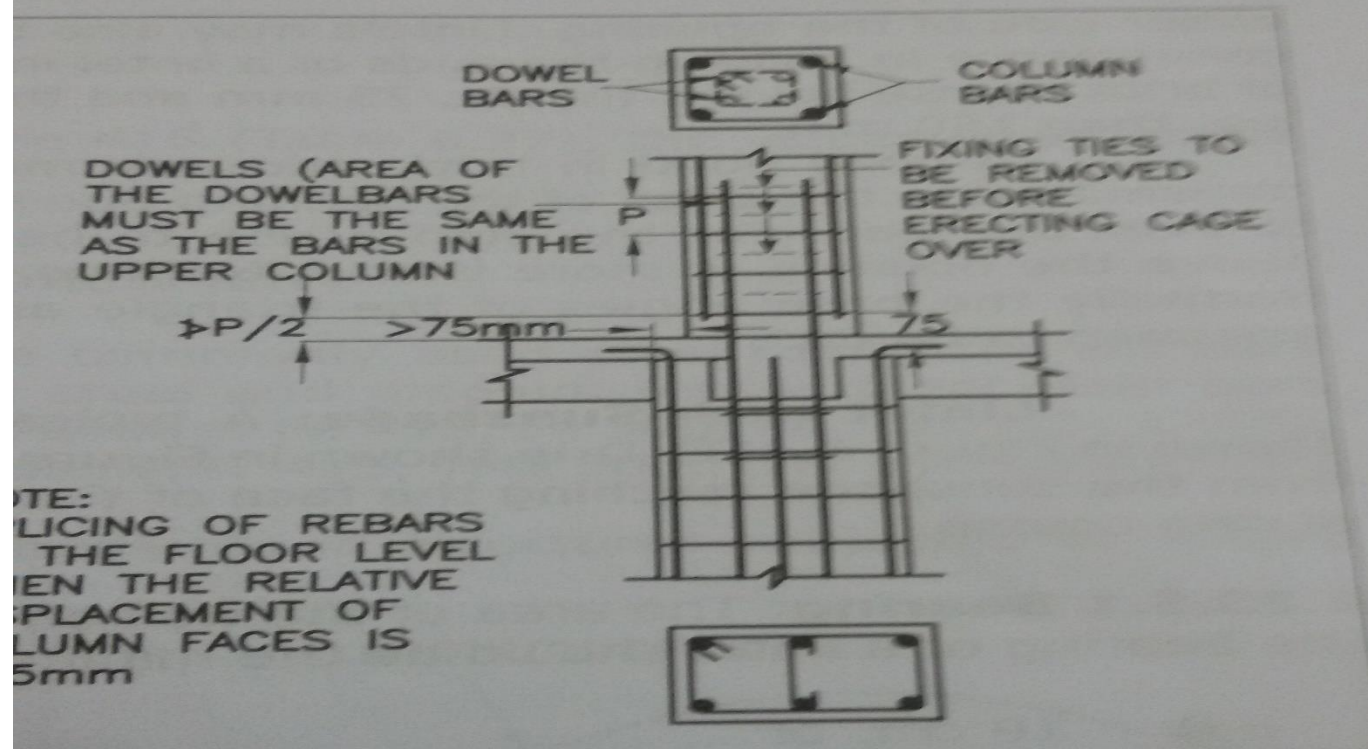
REBAR SPLICE DETAILS AT COLUMNS THAT ARE OFFSET
